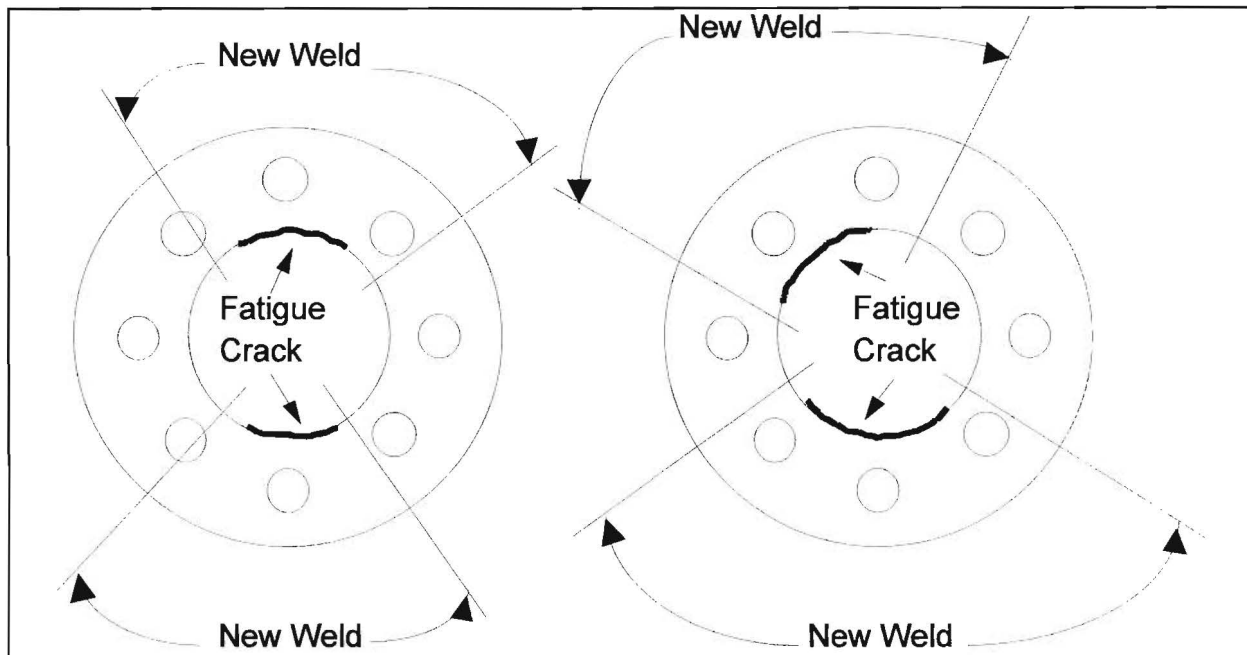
Crack and repair locations on pole-baseplate weld.
